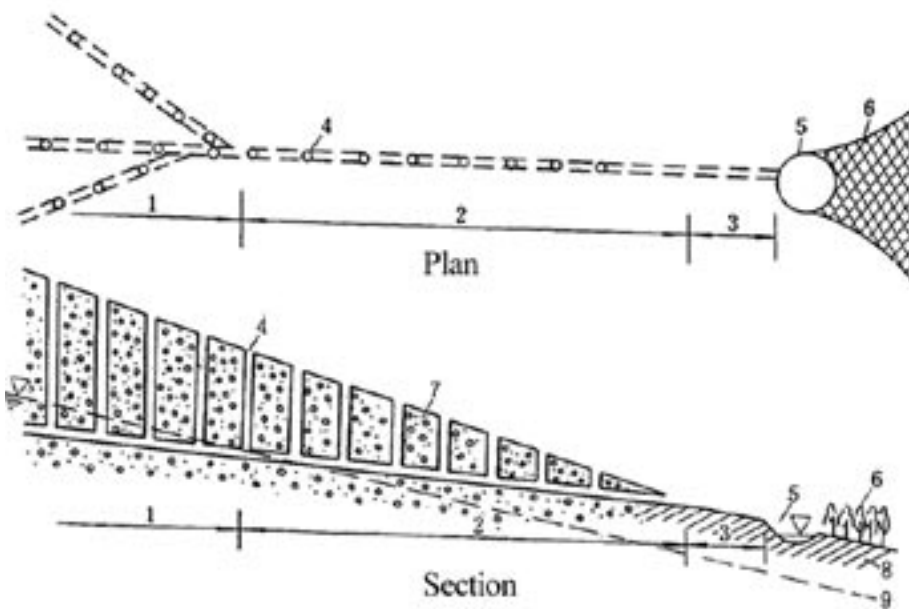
A typical qanat system: (1) infiltration part of the tunnel, (2) water conveyance part of the tunnel, (3) open channel, (4) vertical shafts, (5) small storage pond, (6) irrigation area, (7) sand and gravel, (8) layers of soil (source: <http://www.waterhistory.org/histories/qanats/#figure1>).
